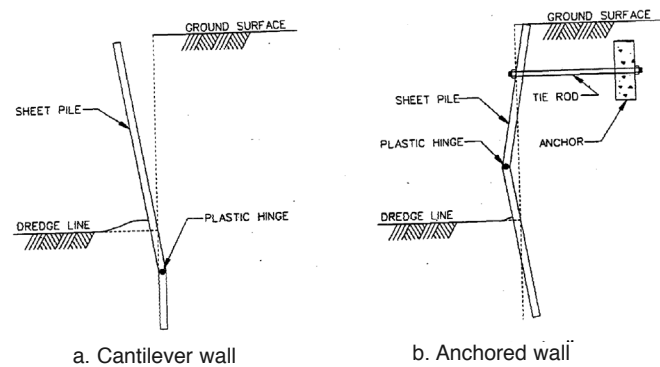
Flexural Failure of Sheet Piling
